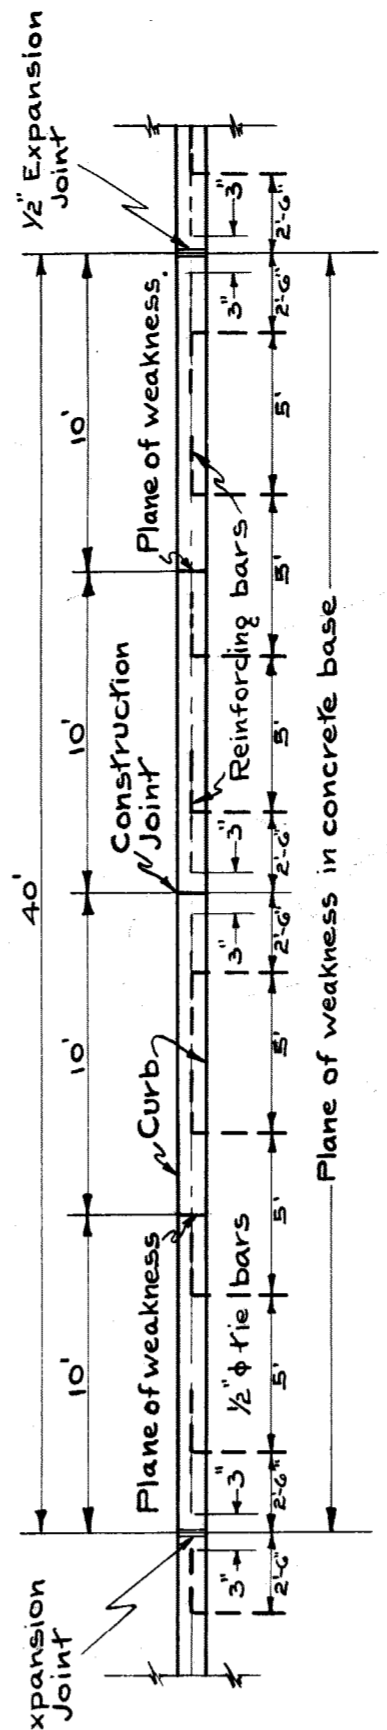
DETAIL SHOWING CONCRETE CURB SCALE 1/4"=1'
